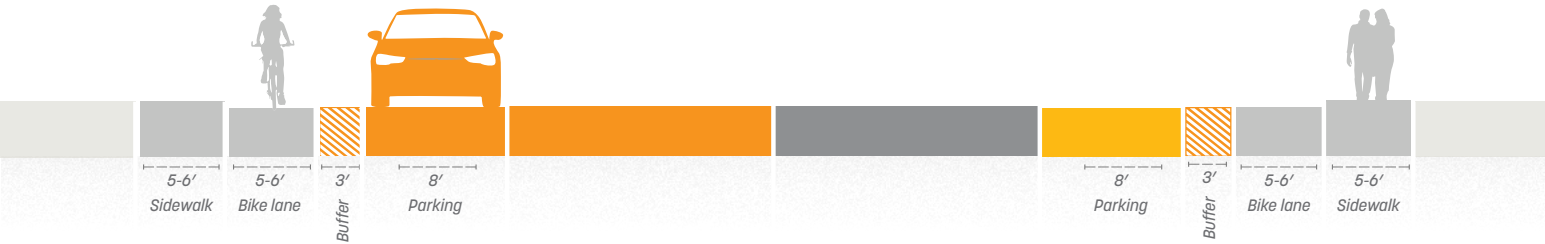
ON-STREET PARKINGS DIMENSIONAL STANDARDS
